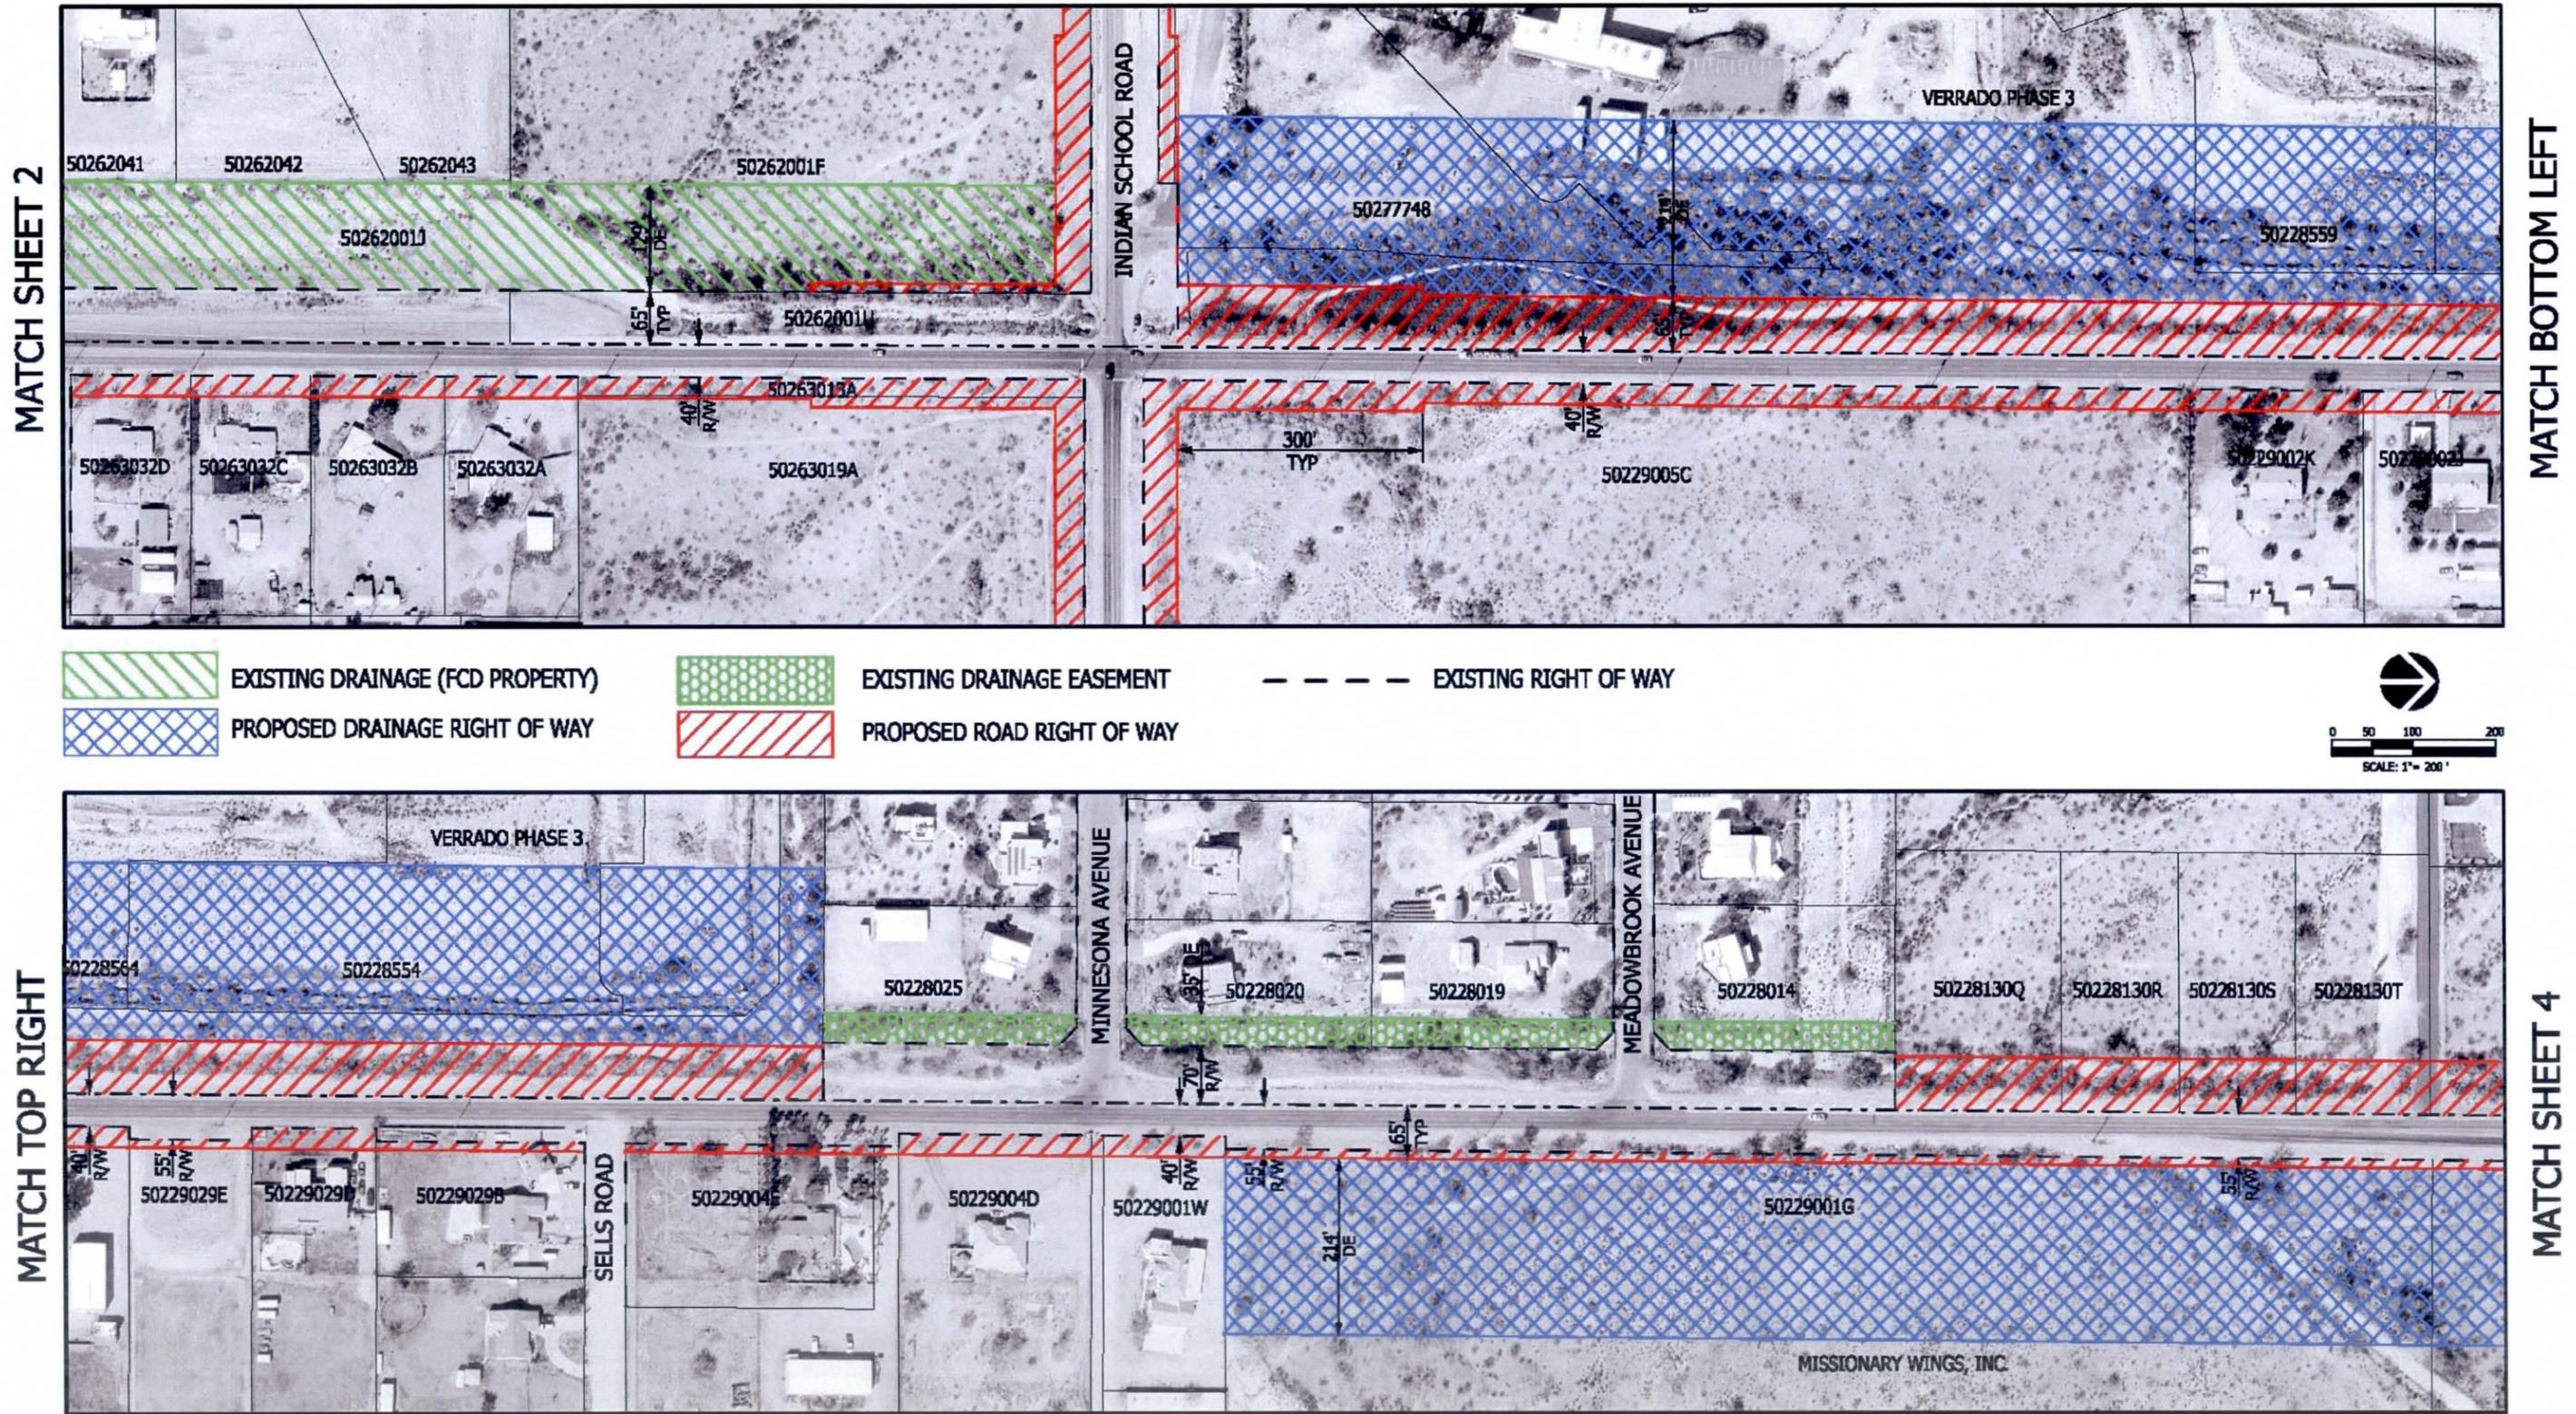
C – EXISTING AND PROPOSED RIGHT-OF-WAY, 3 OF 4
